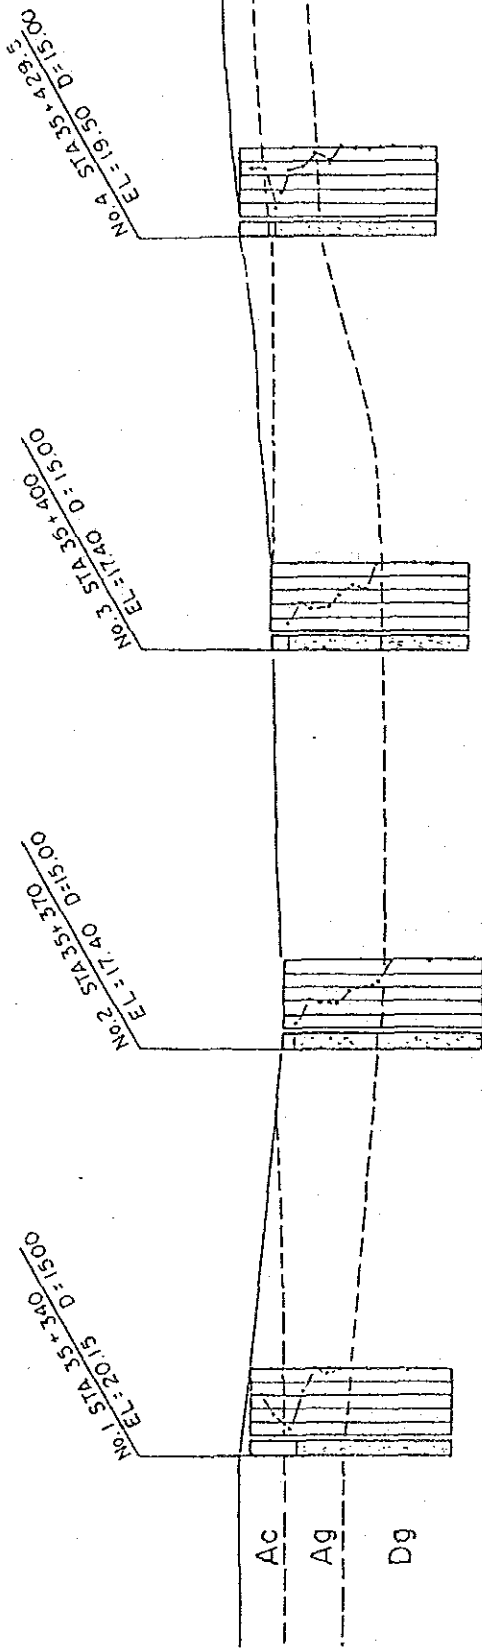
(3/10) COLUMNAR SECTION BORING LOG AND GEOLOGY
